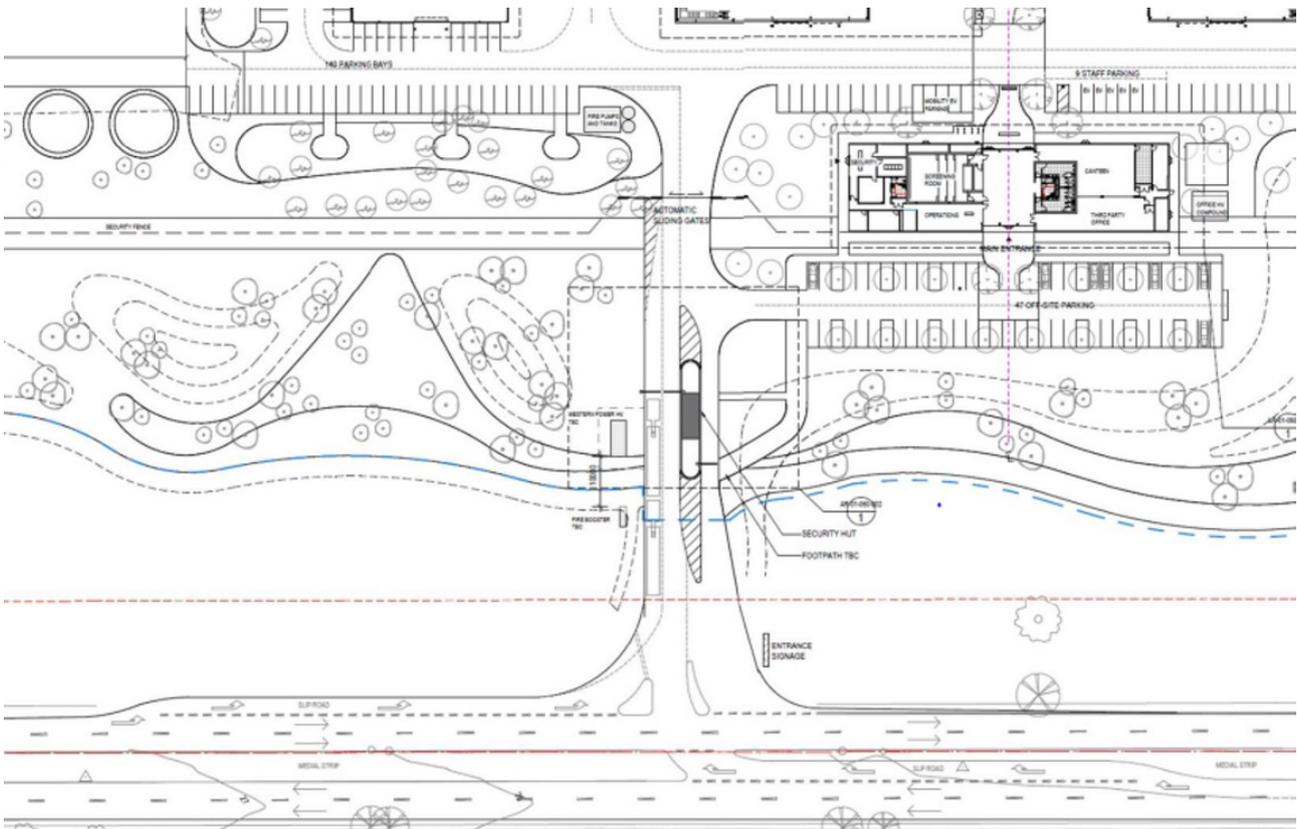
Proposed Ultimate Site Access Arrangements (source: Hassell)
